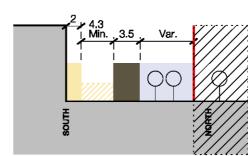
Street coding section: between Plot G and Cambridge Square.
